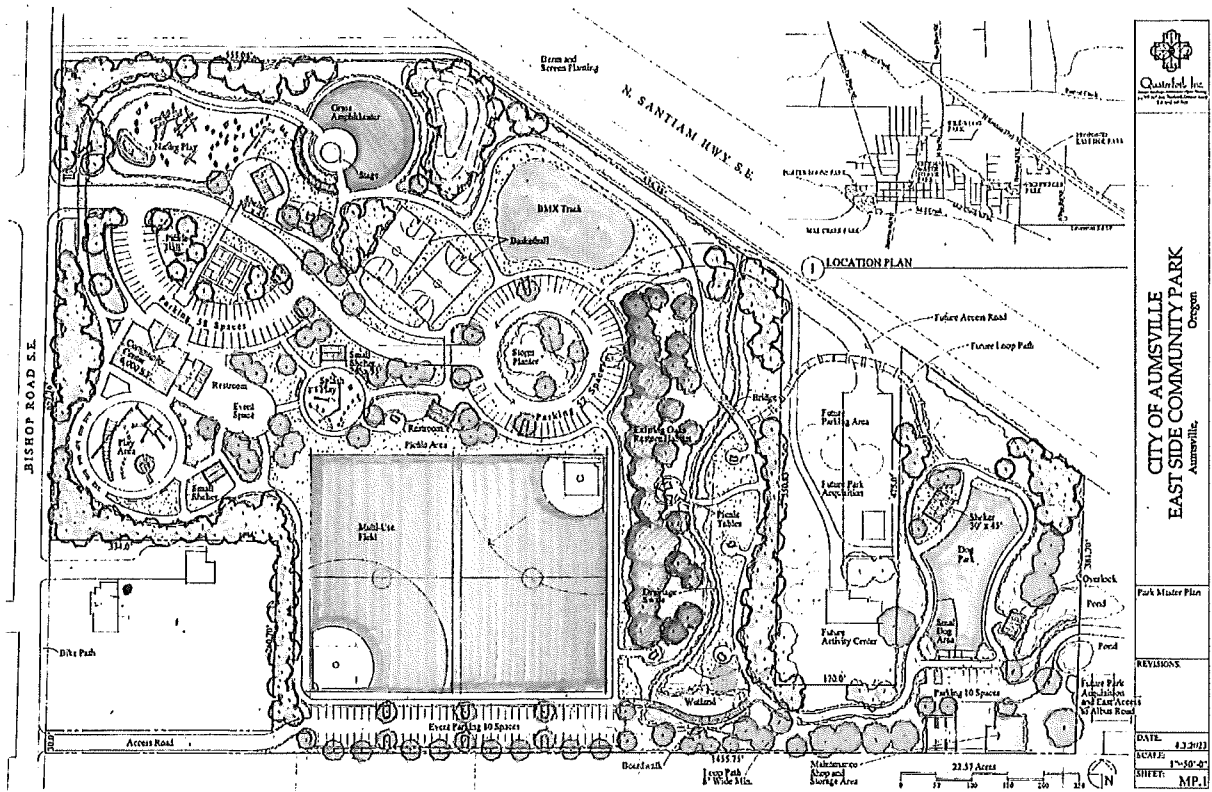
Eastside Community Park Master Plan (Appendix A of the adopted 2023 Aumsville Parks Master Plan)
